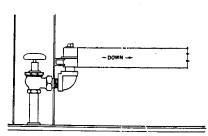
Using Angle Valve outside Recess when pipe space is provided.
